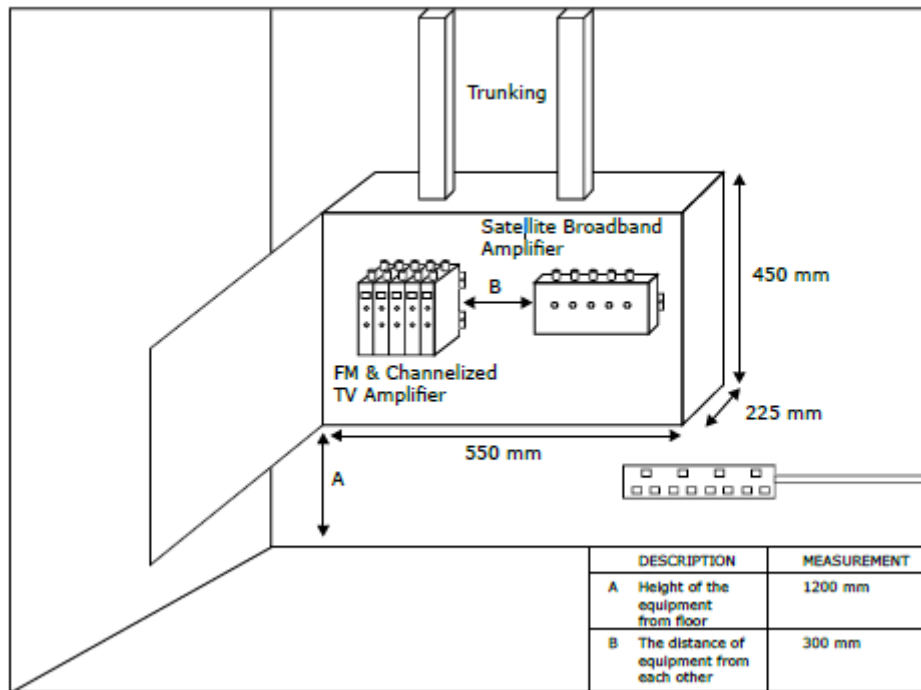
Recommended Head-end equipment arrangement (wall mounted type)
